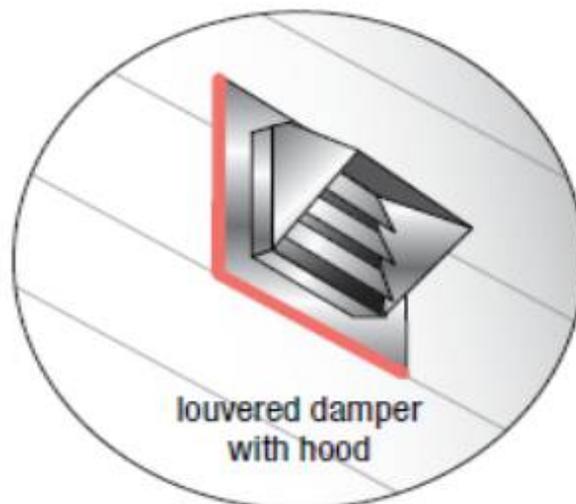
At the outlet of the dryer exhaust duct, install a hooded vent with a louvered damper.
